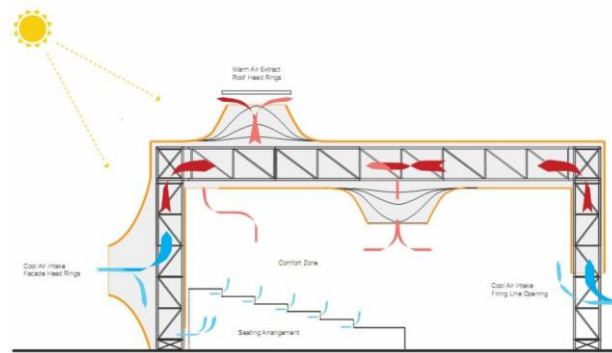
London Olympic Shooting Venue section (Arch2O, 2018)
